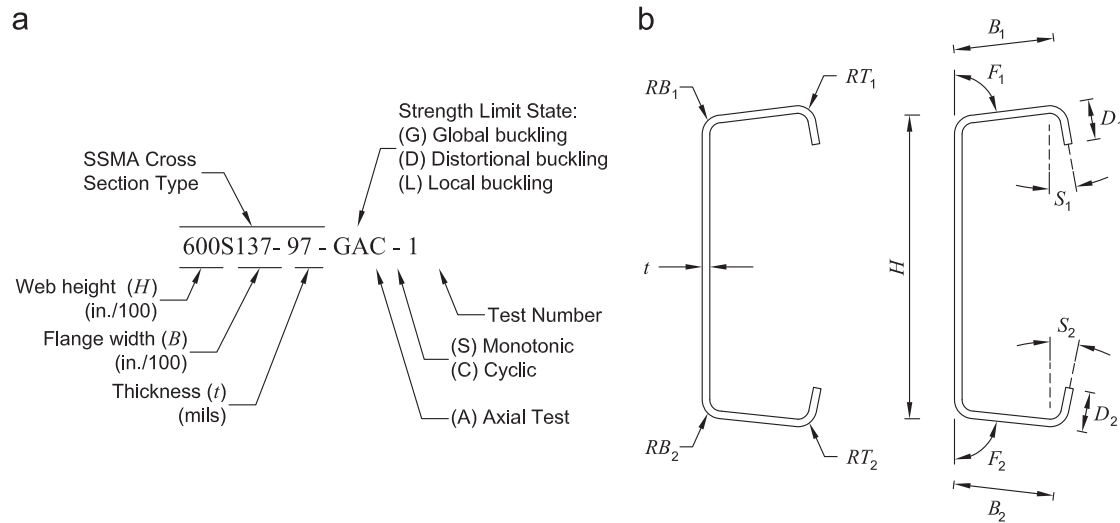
Specimen naming notation (a) and cross-section dimension (b).
